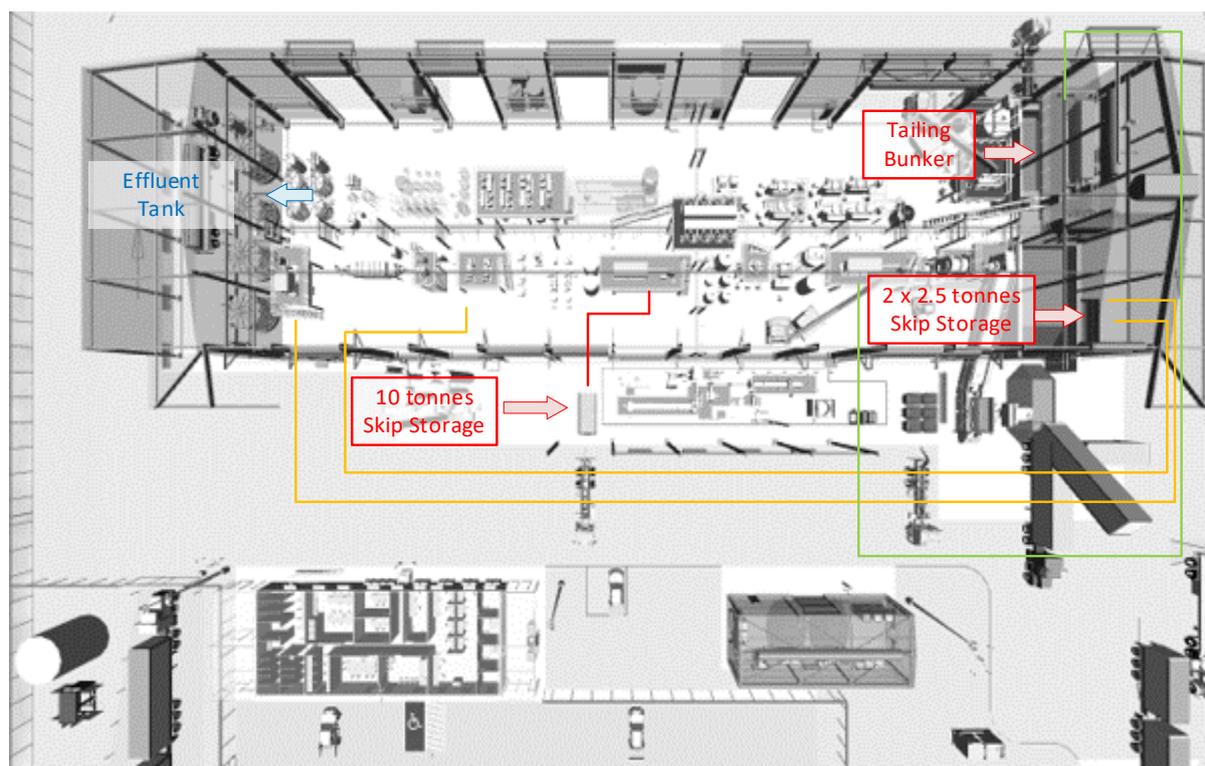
QRCUF Site Layout – On-Site Waste Movements
